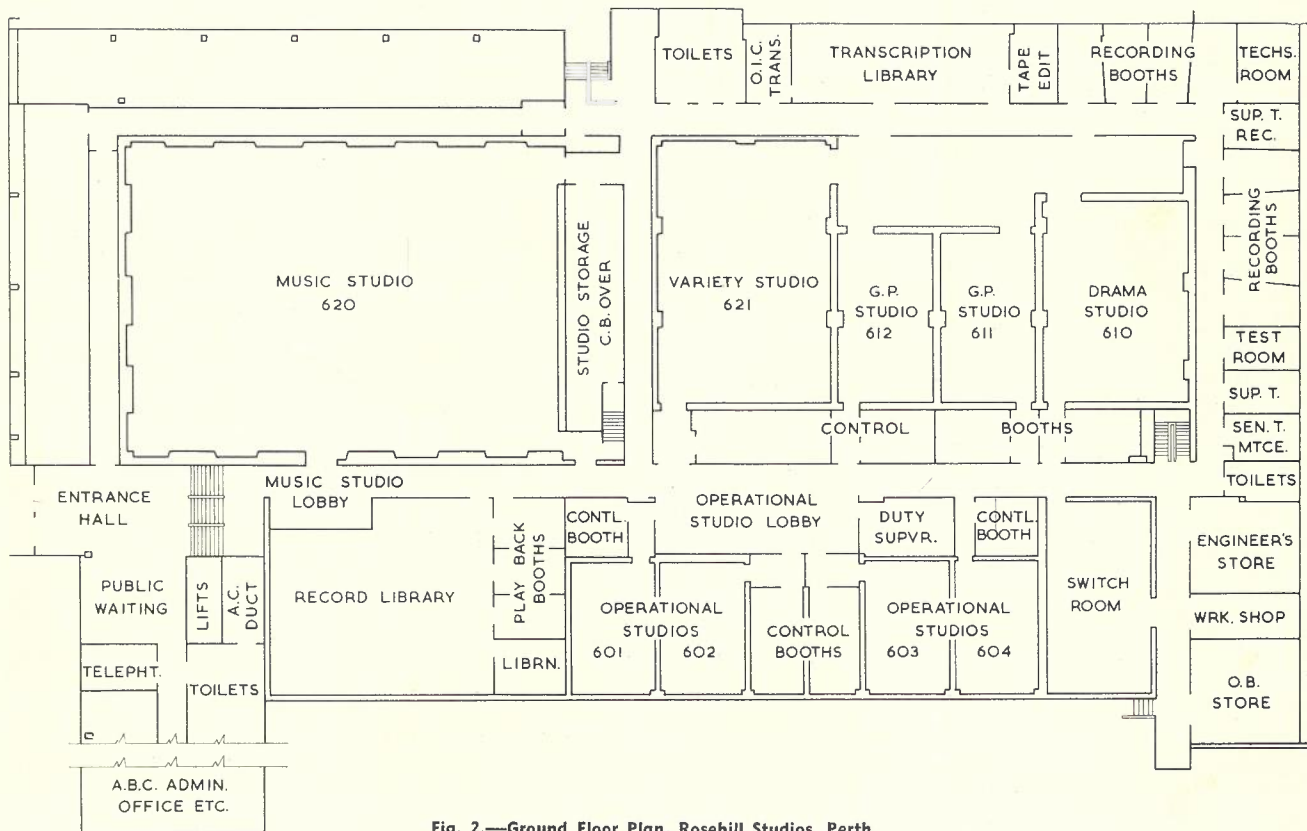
Ground Floor Plan, Rosehill Studios, Perth.
